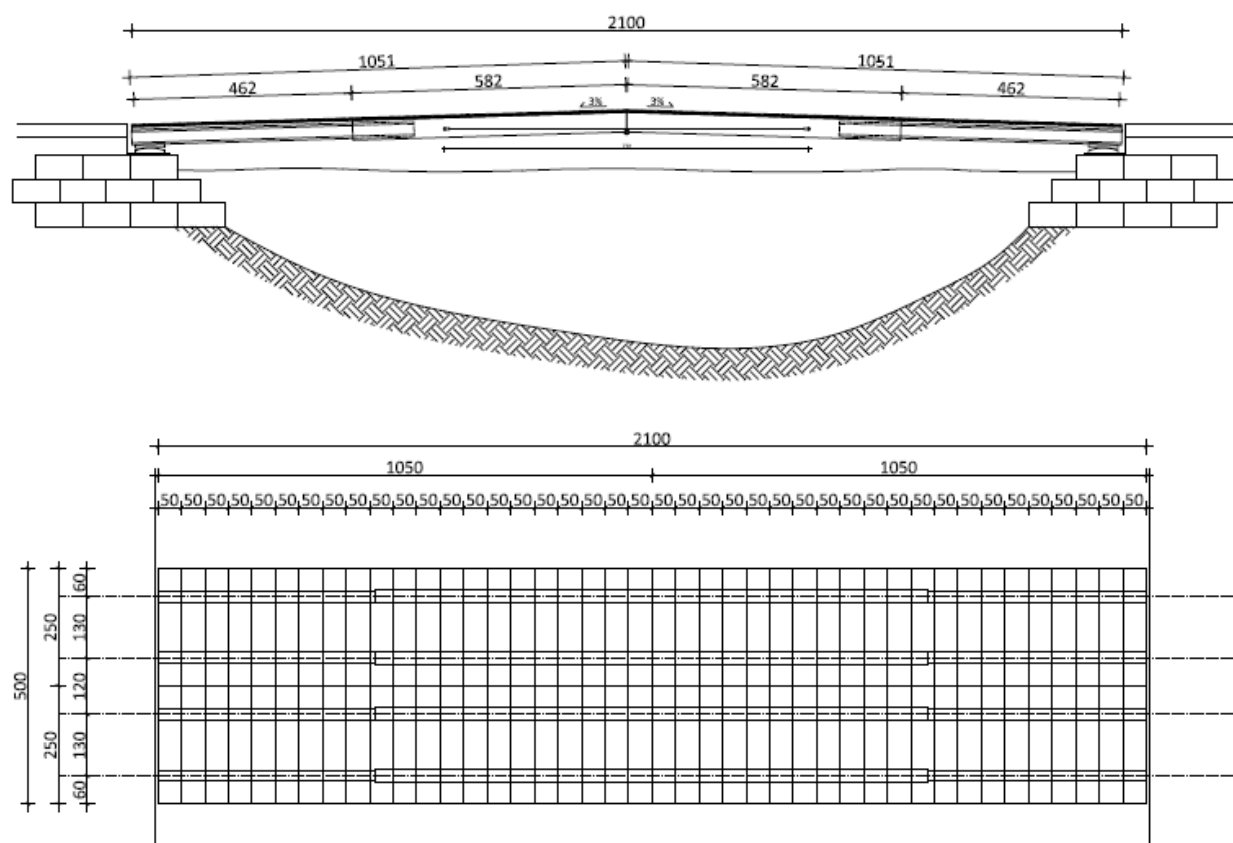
An example for a 21 m long x 5 m width Bridge, side and plan view.
